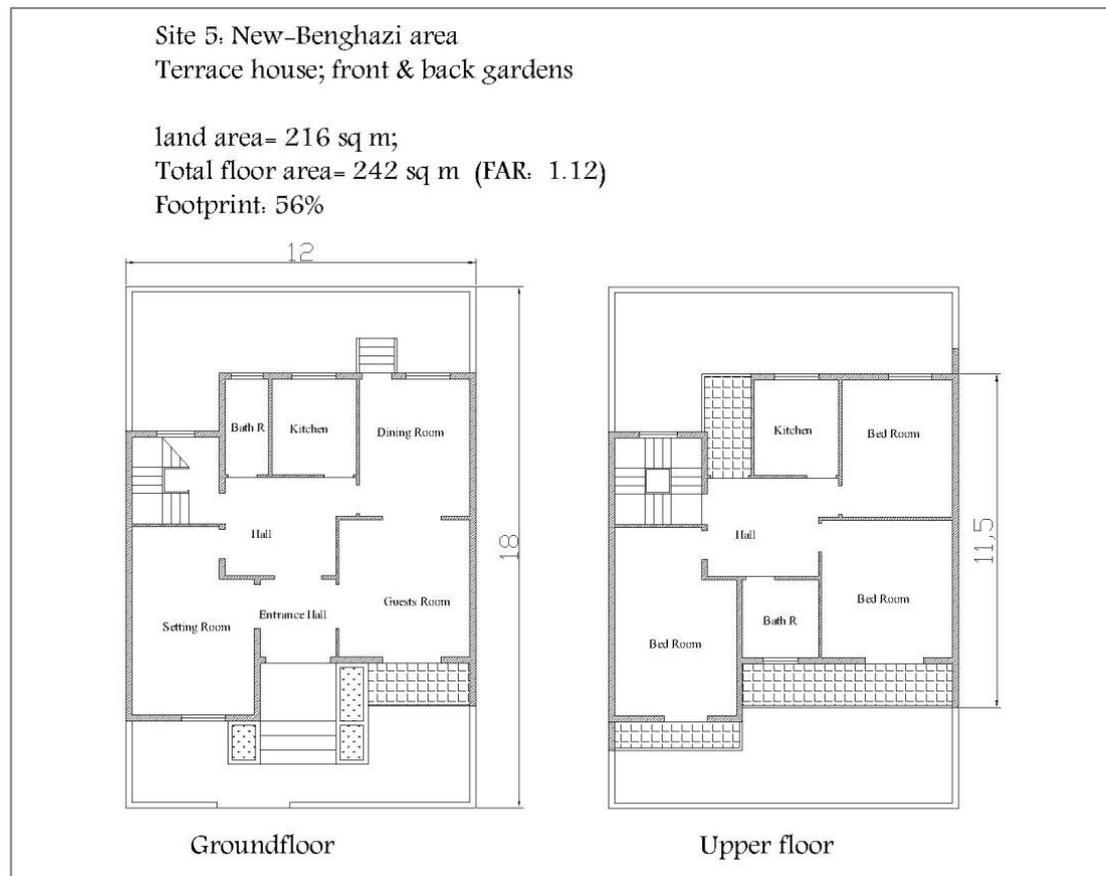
19: Floor Plans, Site Five - New-Benghazi Area
